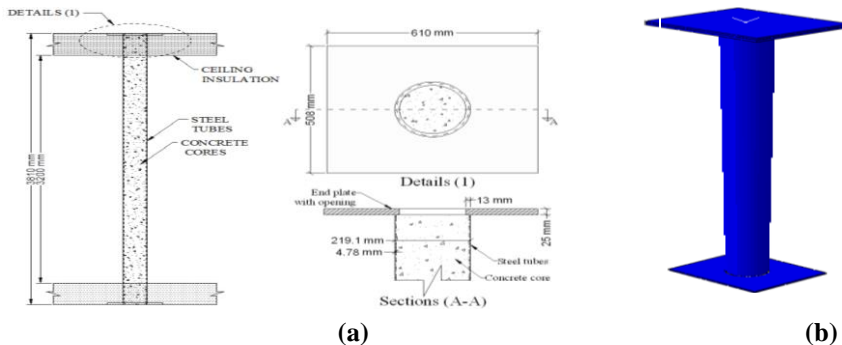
Column specimen C11, a) details and dimensions b) Column CFST modeling in ABAQUS.
